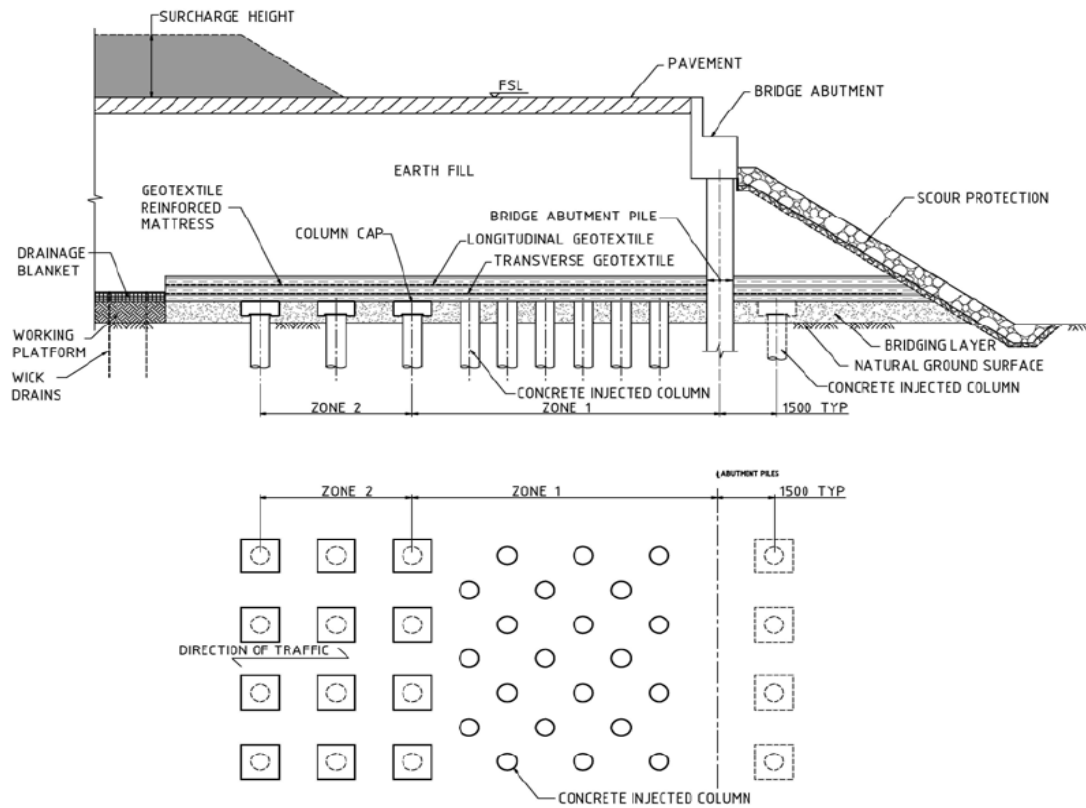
Installation of Concrete Injected Columns (Hsi, 2008).
